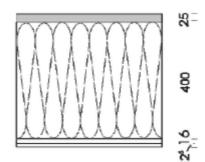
Hannover passive house roof cross section (Heiduk, 2009)
